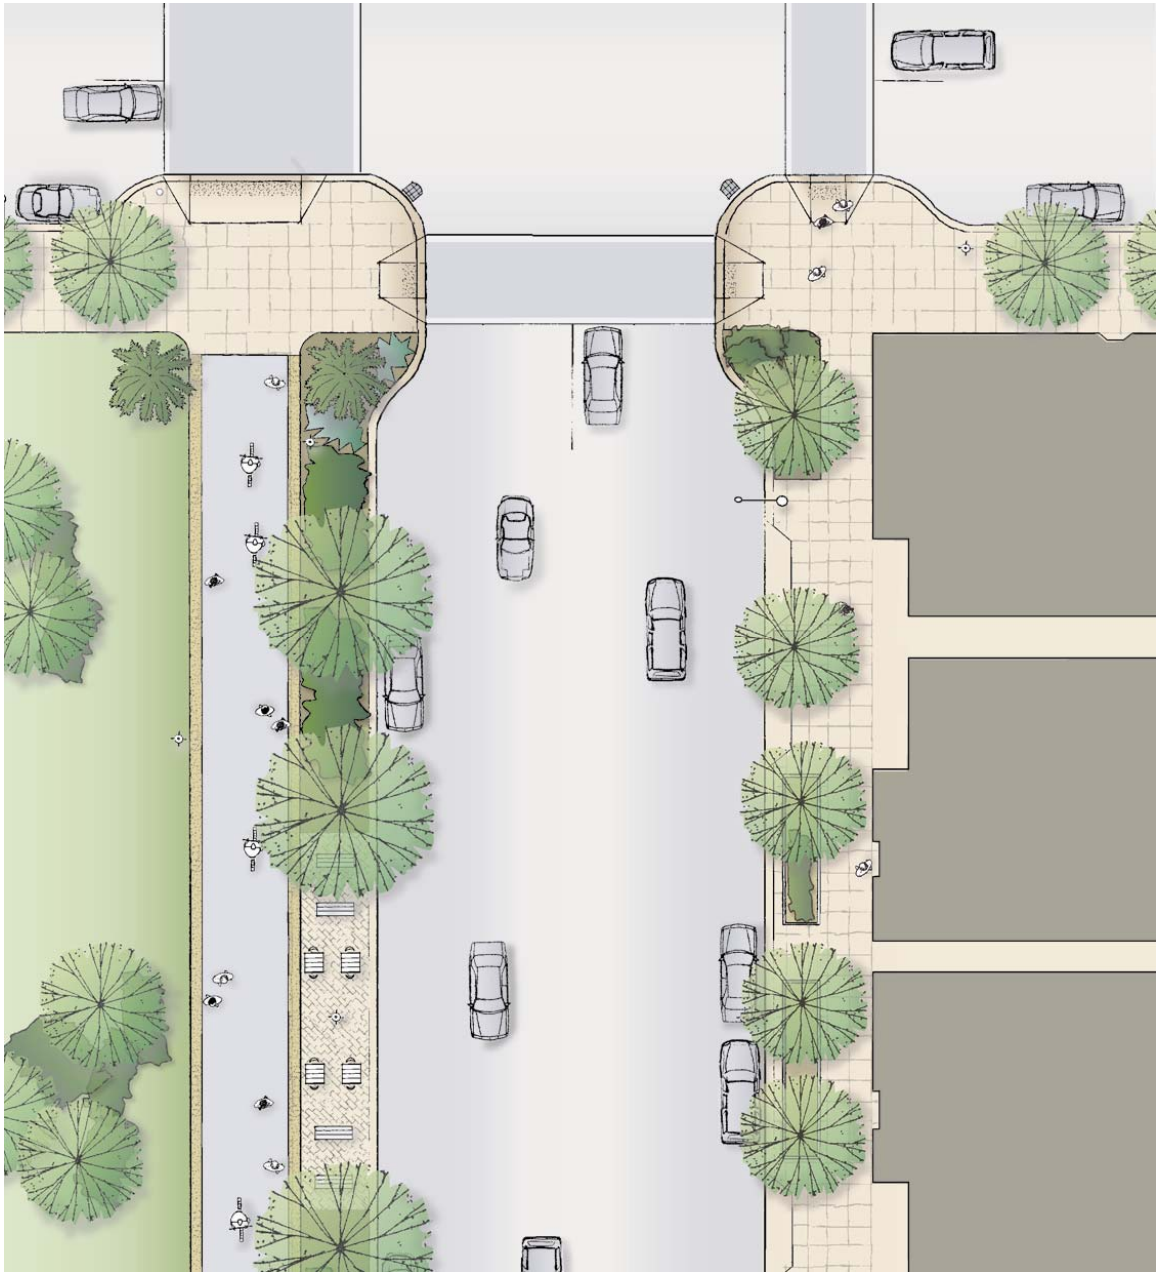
Park edge street showing additional greenery and plantings on non-park side of street
